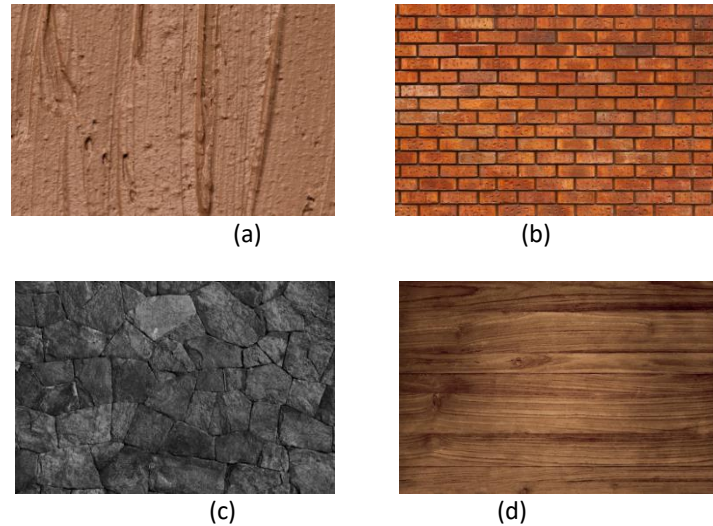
Traditional building materials (a) clay, (b) brick, (c) stone, and (d) wood
